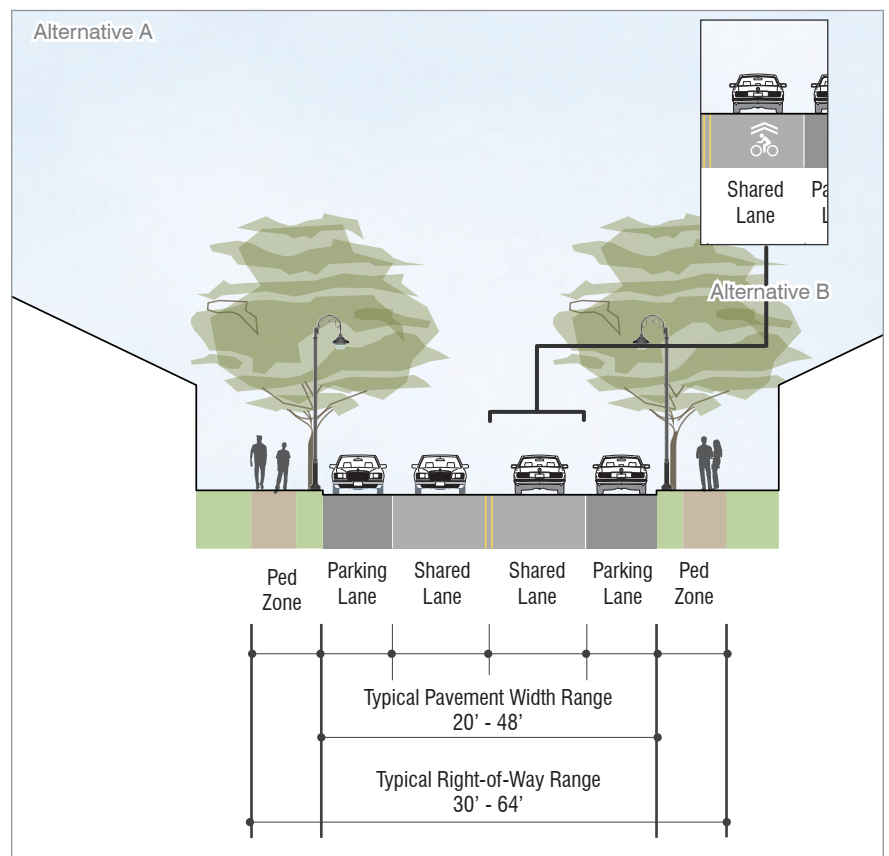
Typical Existing Street Section for 'Residential Road' Typology
